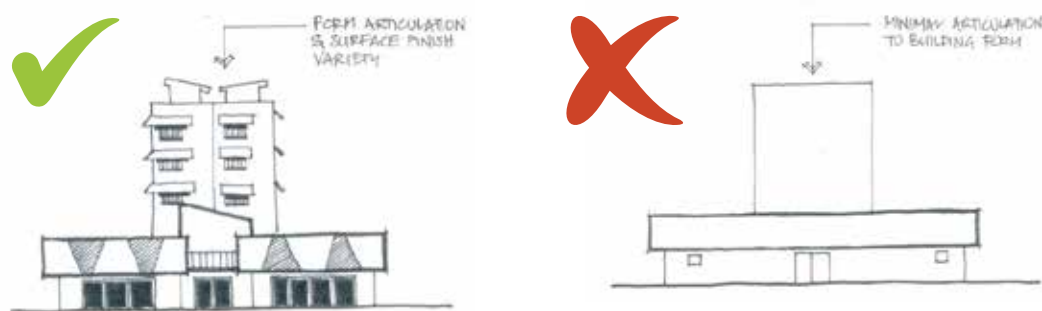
Richness and variety is provided in the building's form. Buildings incorporate design elements and detailing to minimise the bulk of large buildings
